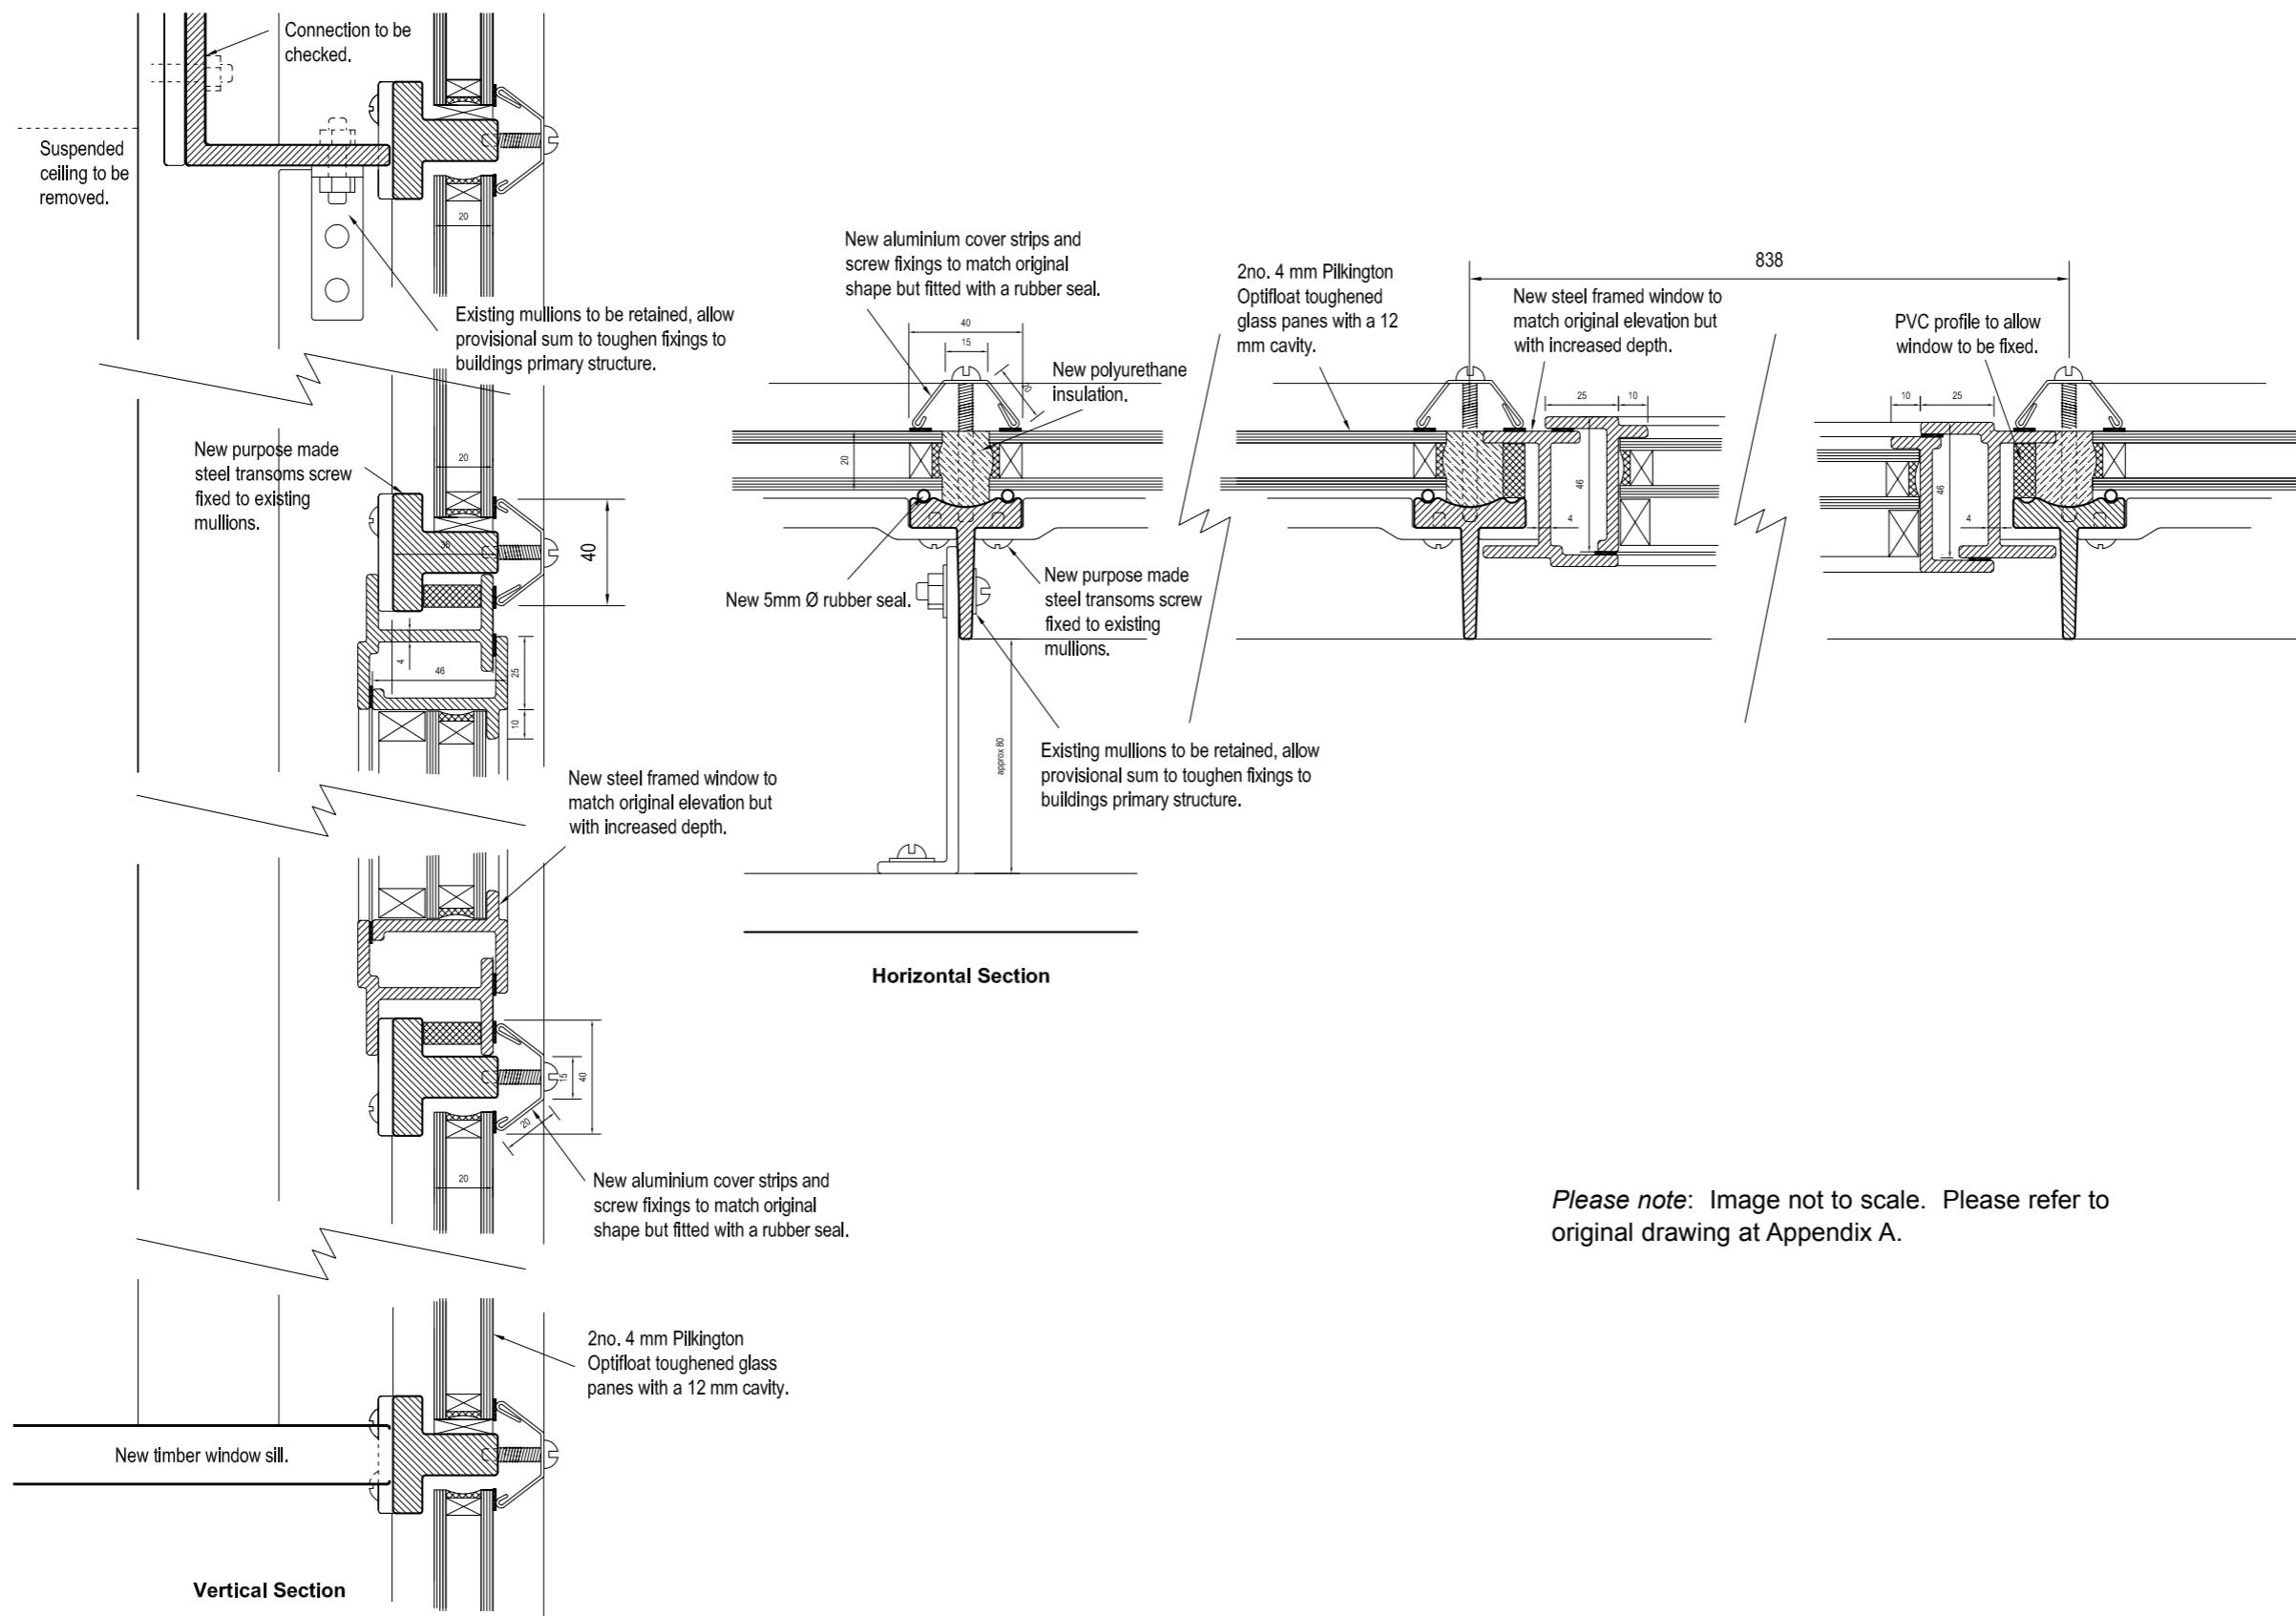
Drawing S11: Proposals for upgrading the existing façade system
